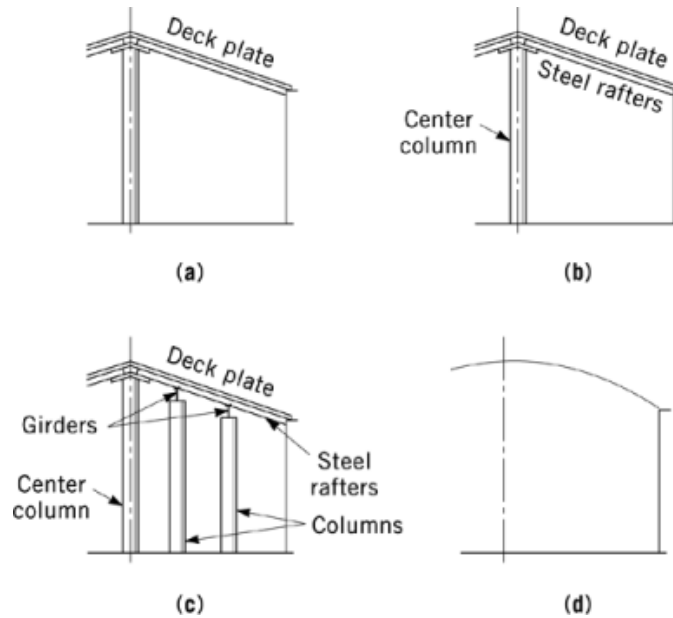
Fixed-roof tanks: (a) self-supported cone roof; (b) center-supported cone roof; (c) column-supported cone roof; and (d) dome or umbrella roof.
